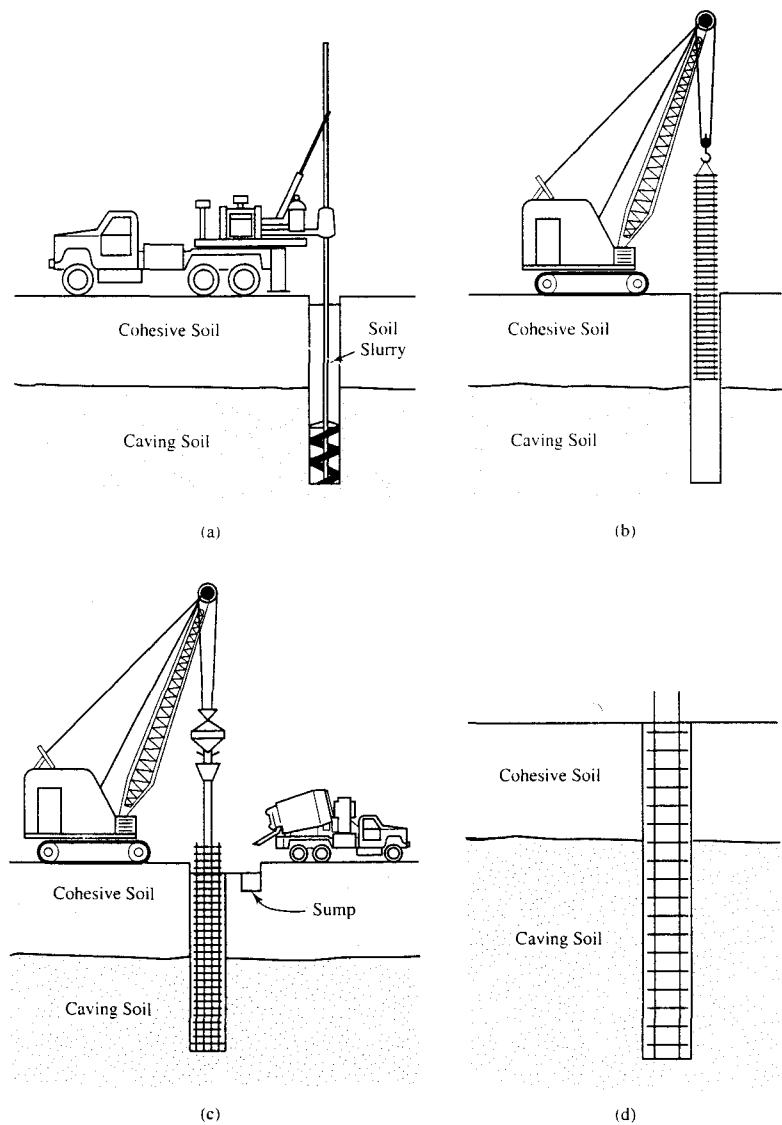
Using drilling fluid to deal with caving or squeezing soils: (a) Drilling the hole using slurry; (b) Installing the reinforcing steel cage through the slurry; (c) Placing the concrete using a tremie pipe and recovering slurry at the top; and (d) The completed foundation (Reese and O'Neill, 1988).
